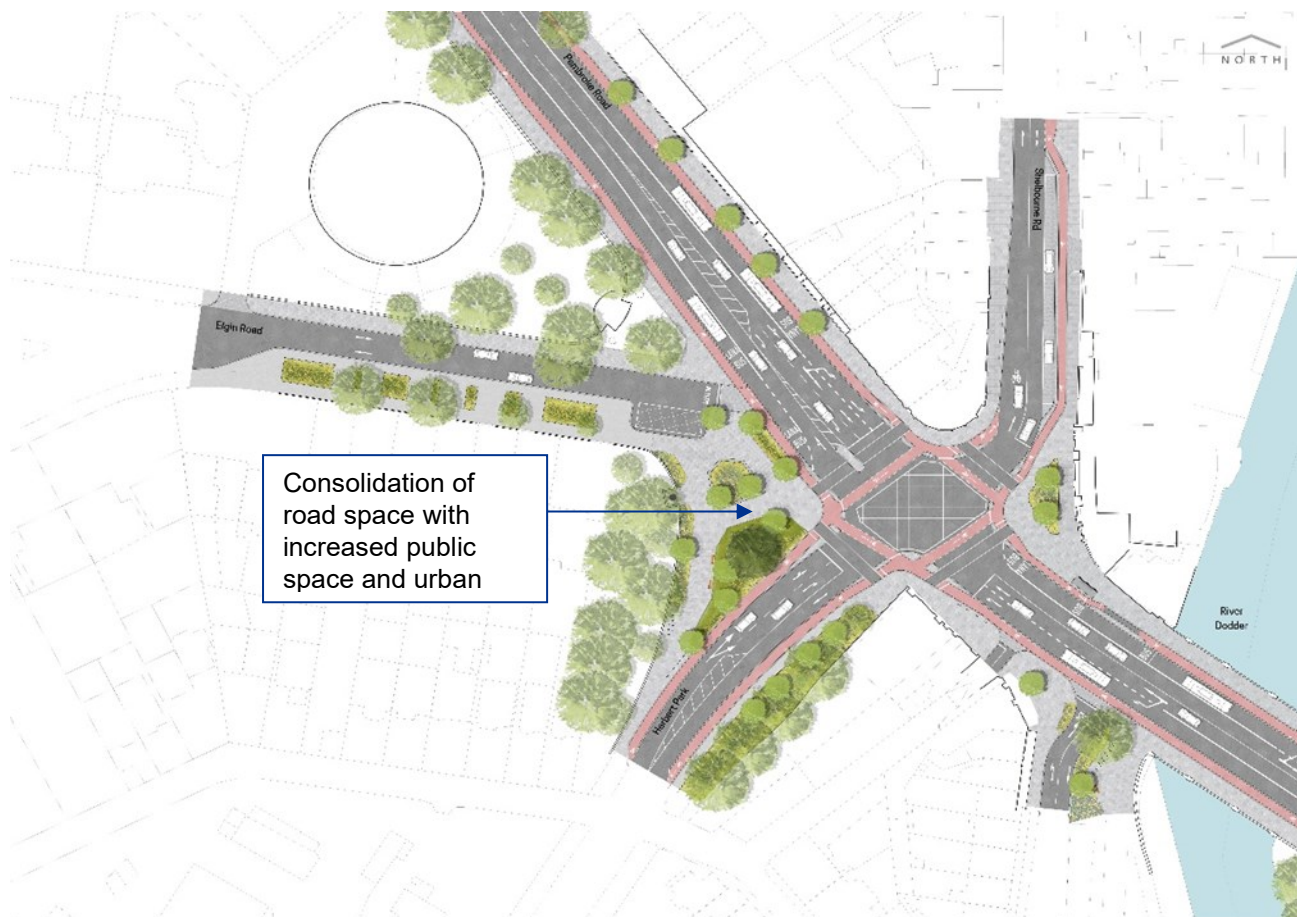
Ballsbridge at Herbert Park, Shelbourne Road and Elgin Road
